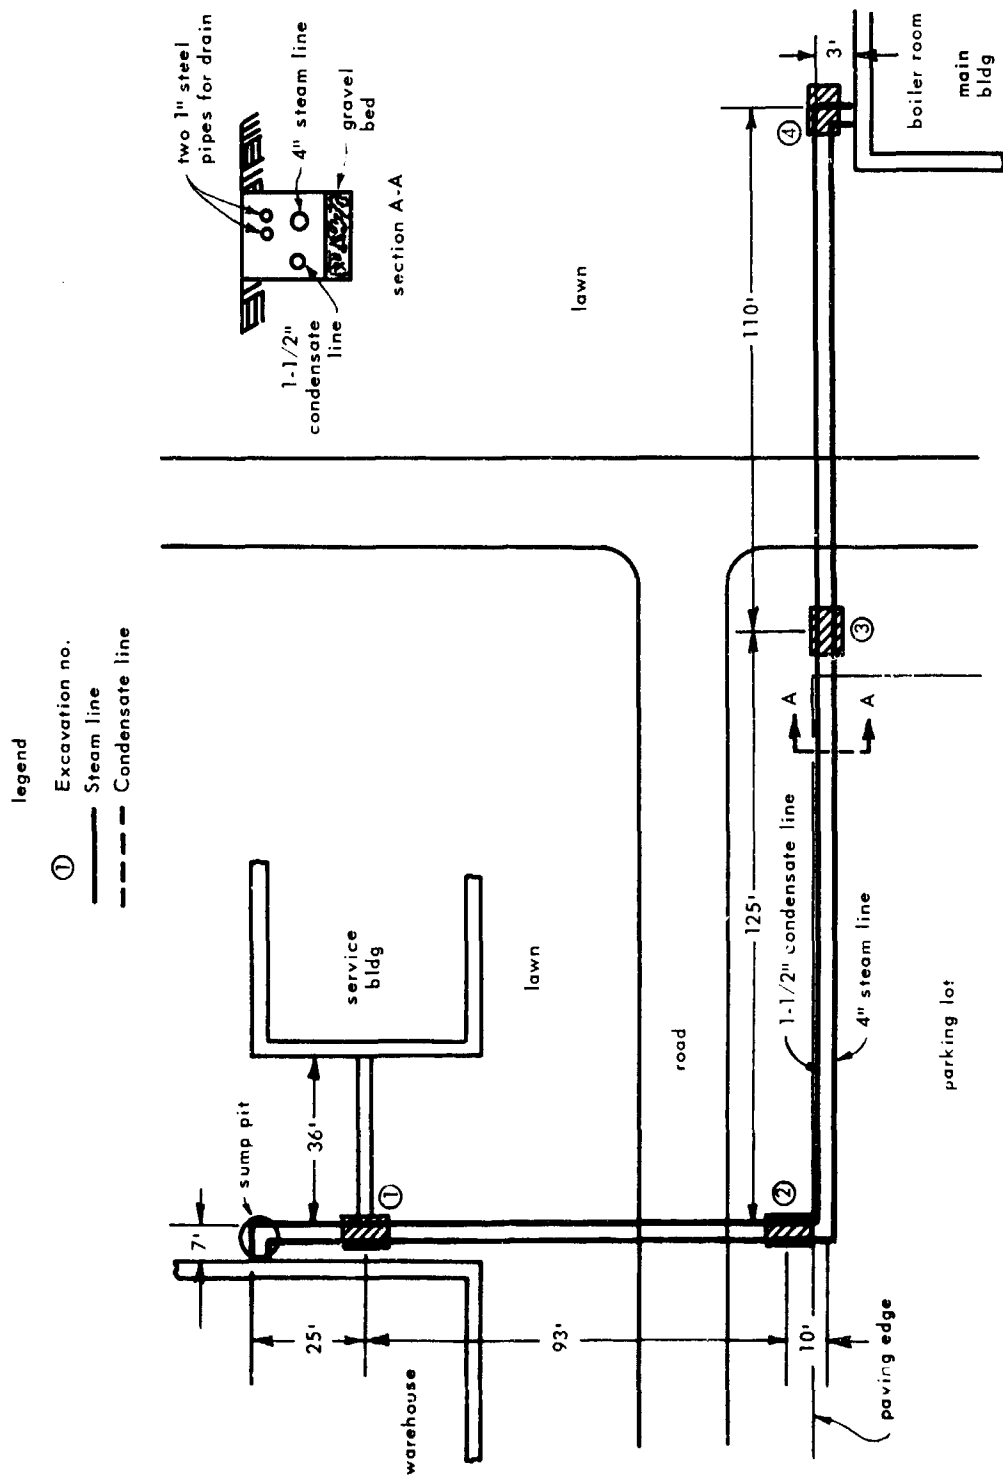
Plan view: location of underground steam and condensate pipes, Ochsner Foundation Hospital, New Orleans, Louisiana.
